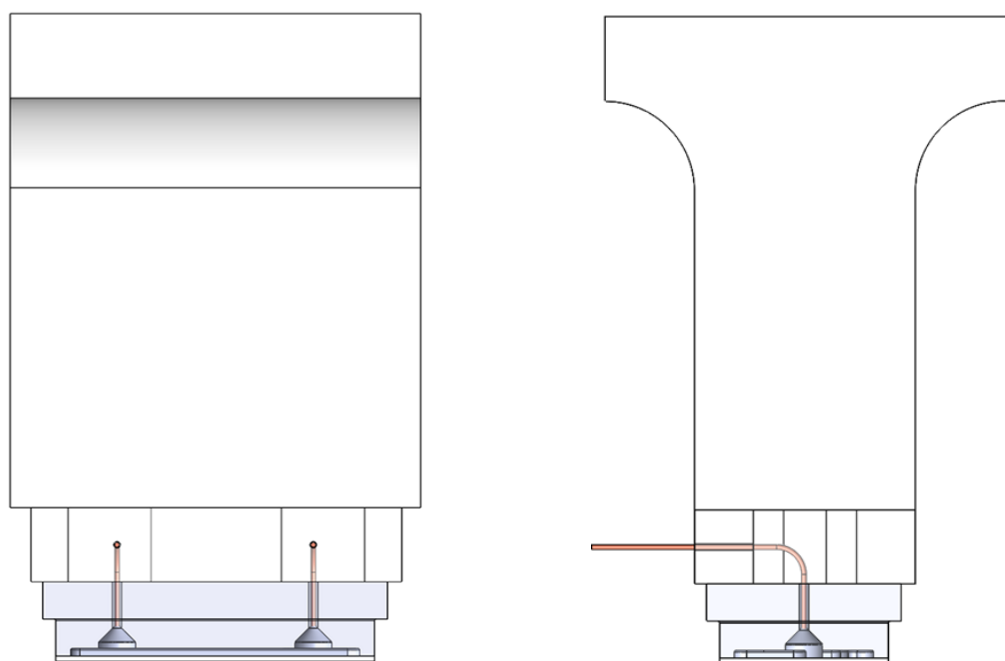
Left: Front side view of sample. Right: Side view of sample.
